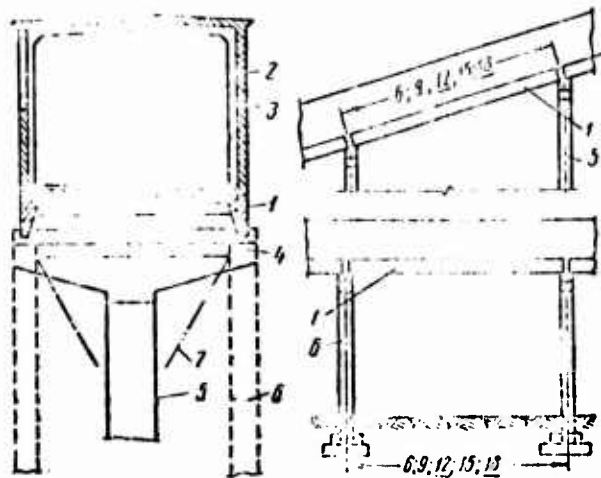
Structural ferroconcrete prestressed conveyor gallery with a span of 6, 9, 12, 15, 18 m: 1 - prestressed ferroconcrete ribbed slab; 2 - lightweight transverse frame made from steel, aluminum or wood; 3 - asbestos-cement shields or panels; 4 - structural crossmembers; 5 - upright of the support for its central arrangement; 6 - upright of the frame; 7 - joints.
